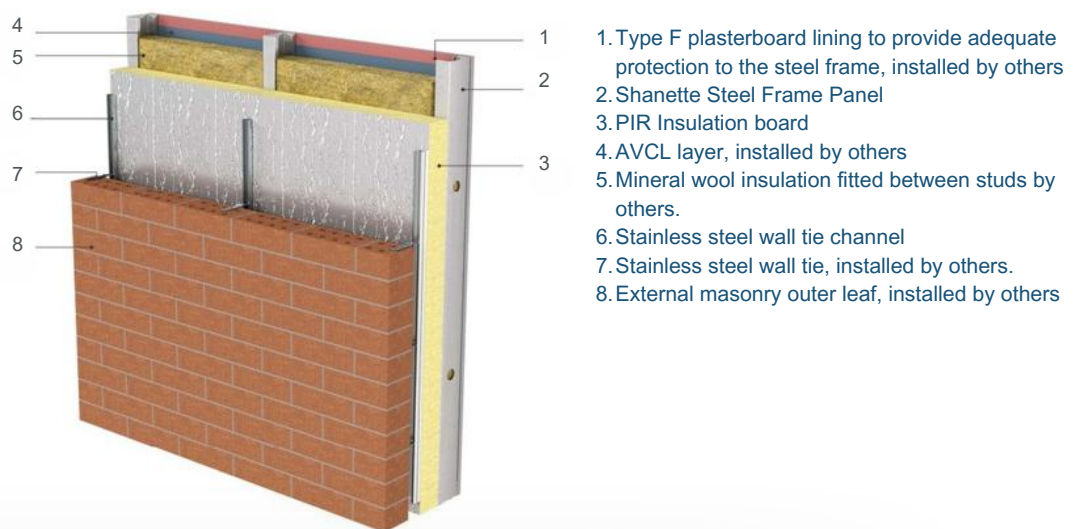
External Wall with PIR Insulation & Masonry Outer Leaf – Hybrid Frame
